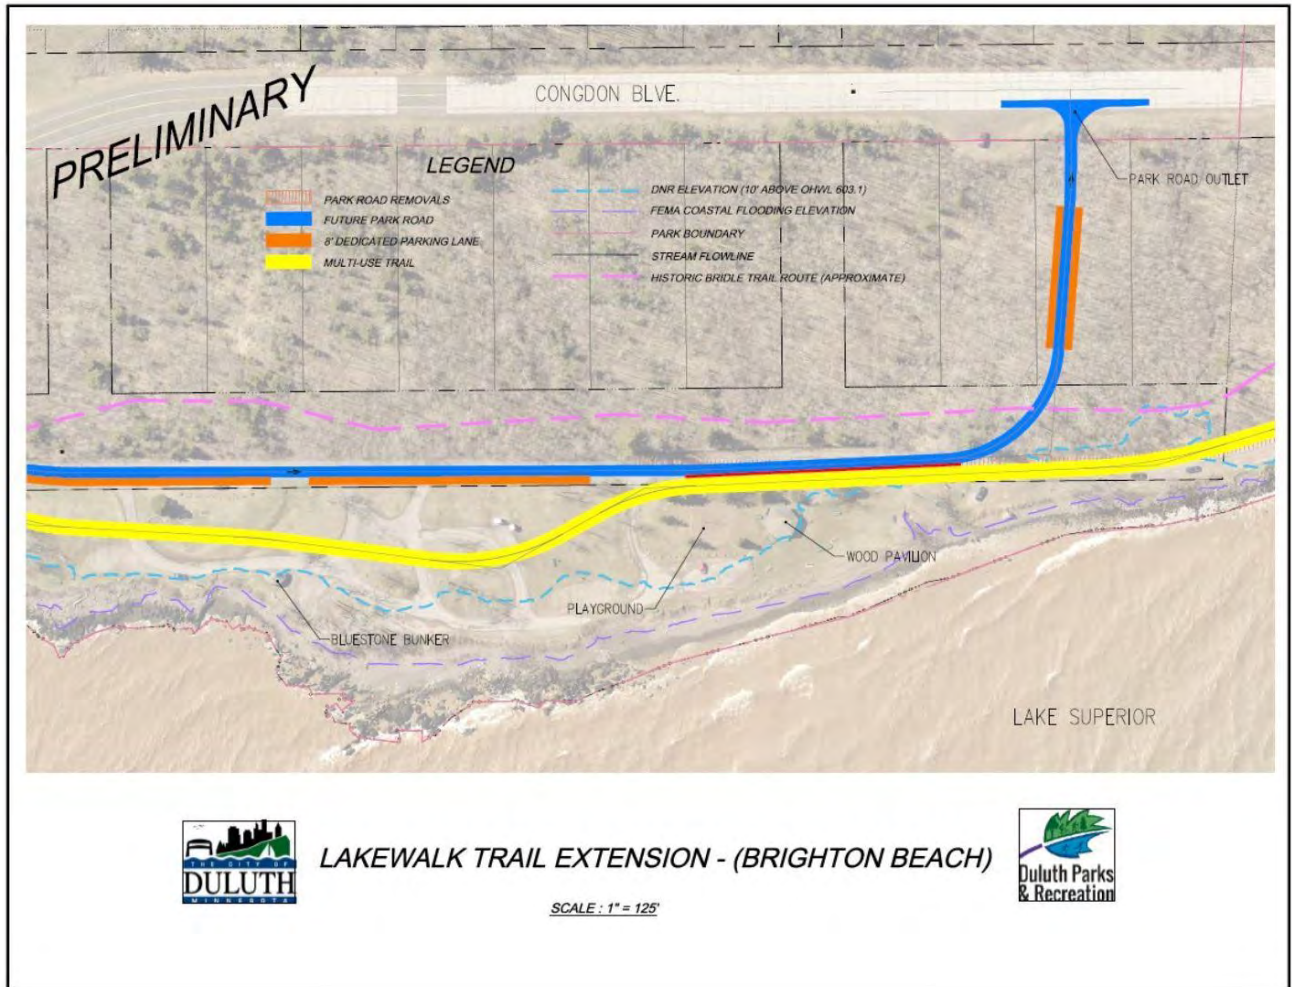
Preliminary proposed roadway realignment, view of eastern end of Kitchi Gammi Park and Brighton Beach Road, showing new roadway connection to Congdon Boulevard and end of trail extension. New roadway indicated in blue. Trail extension indicated in yellow. Parking areas indicated in orange.
